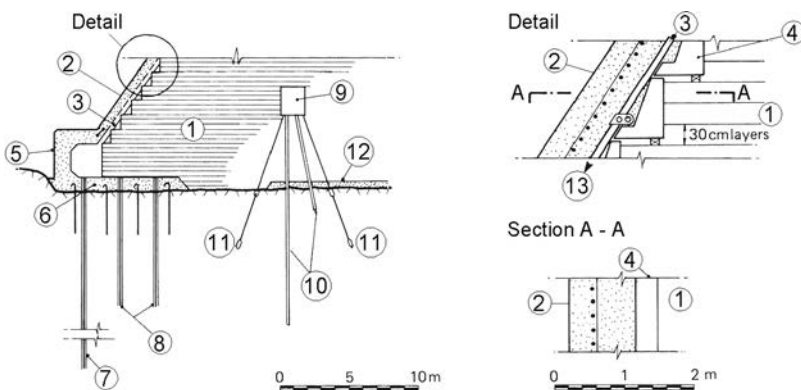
Upstream facing and galleries for the FSHD (after Londe & Lino, 1992). (1) Hardfill; (2) waterproof facing; (3) drains (perforated PVC pipes); (4) prefabricated element; (5) face drainage gallery; (6) grouting slab; (7) deep grout curtain; (8) consolidation grouting; (9) foundation drainage gallery; (10) drains; (11) electrical pore pressure cell; (12) porous concrete; (13) to the gallery.
